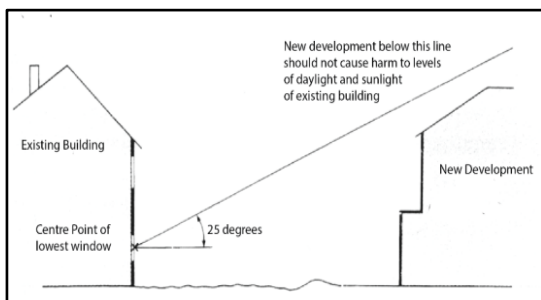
Section in plane perpendicular to the effected window wall from existing to proposed development showing acceptable application
